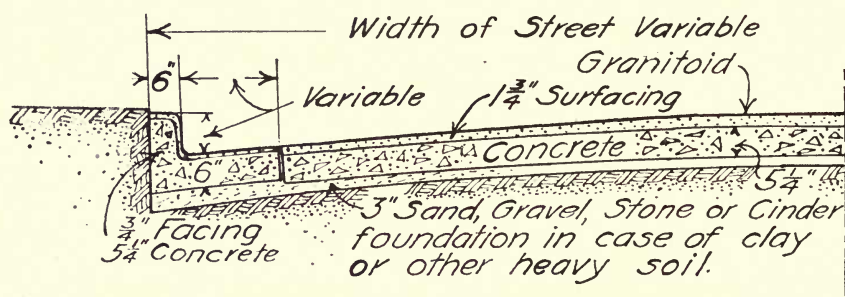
STANDARD SECTION BLOME CO. PATENTED GRANITOID PAVEMENT.
